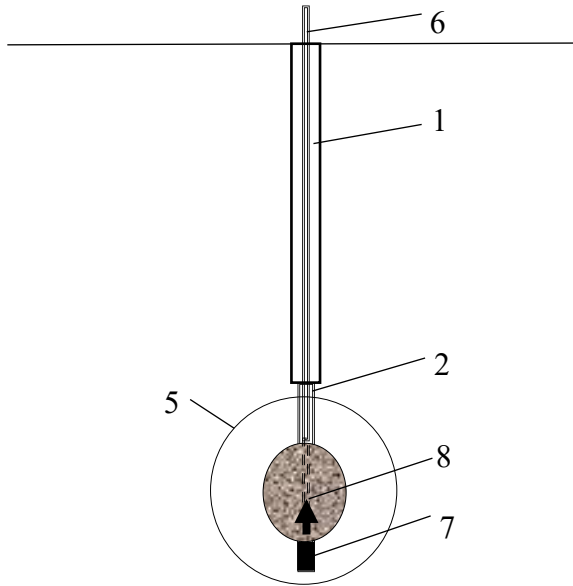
Grouting the Dry Well (1 Lined Well Section; 2 Open Well Section; 5 Planar fracture in plain view; 6 Grouting trummy pipe; 7 Bottom Seal; 8 Grouting trummy pipe moving direction).
